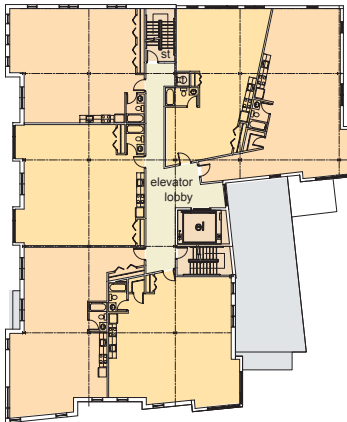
Typical upper floor plan, ARTBLOCK West. (ICON architecture)
